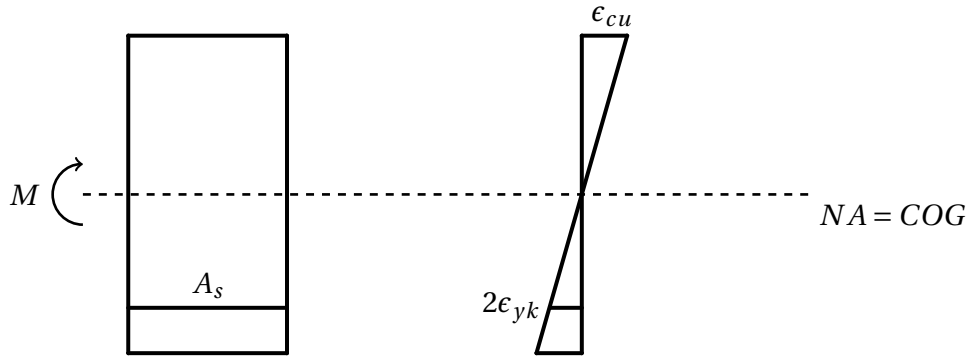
Ductile design of a reinforced concrete beam loaded in bending.
